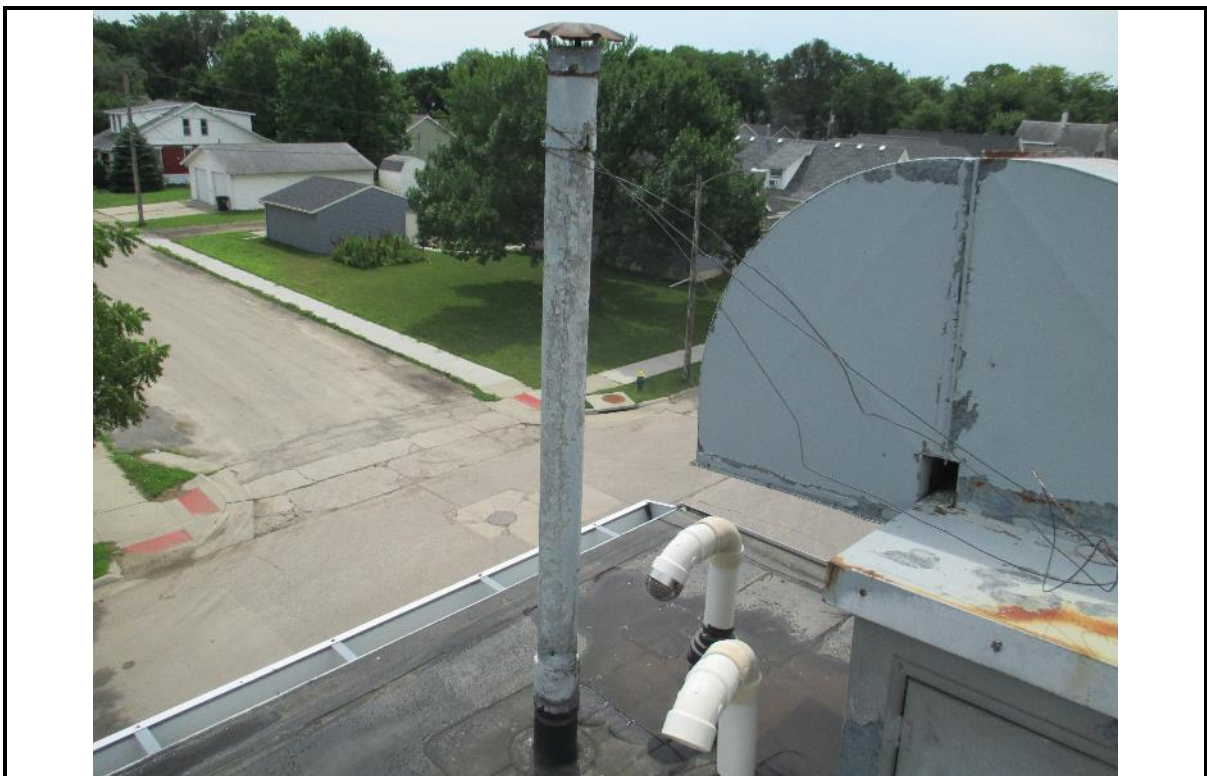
View of asbestos-containing cement pipe on lower roof, southeast corner.
